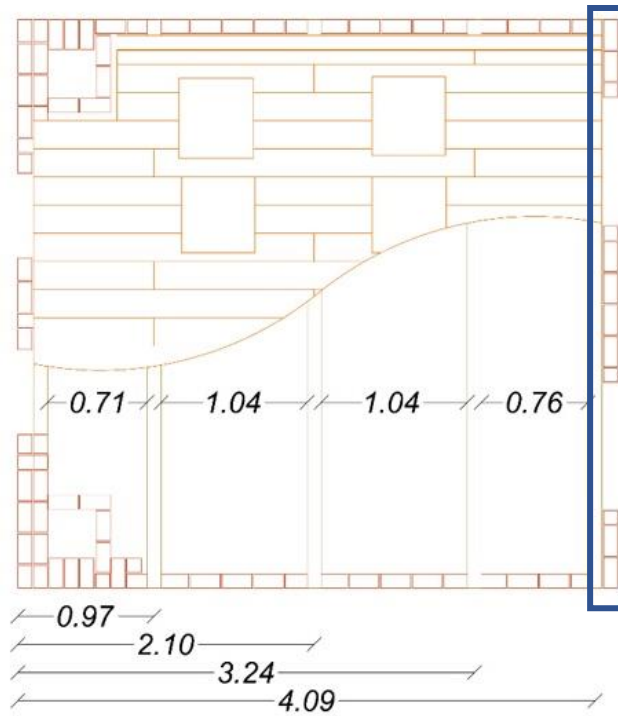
First-floor plan of the prototype building: location of gable wall [4, p. 5]
